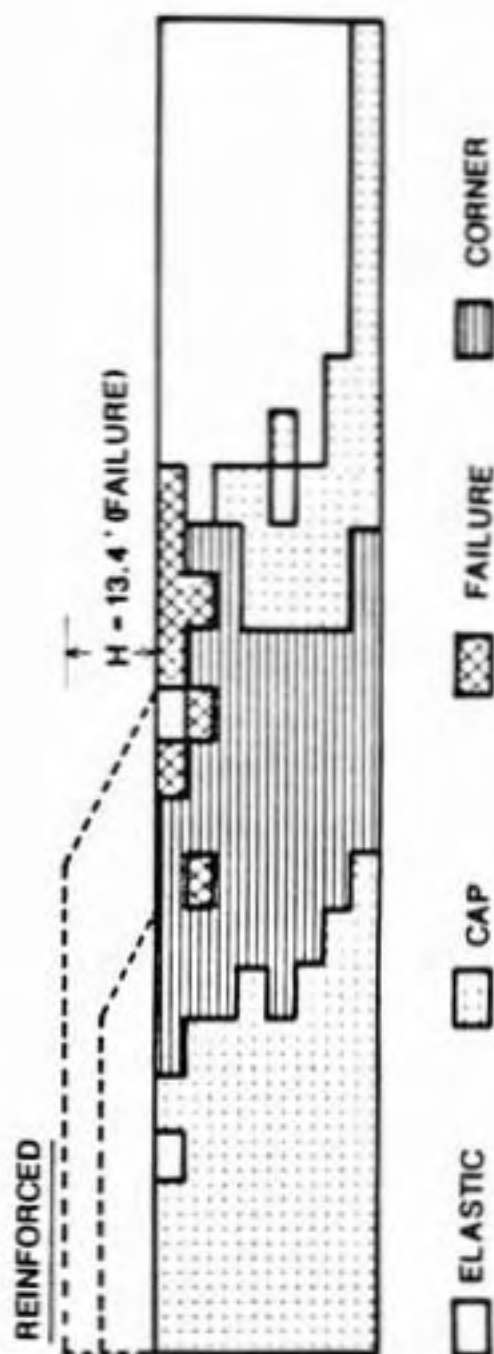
State in foundation for reinforced embankment at height of 13.4 ft (failure). 7.5-ft high existing embankment, 30-ft widened section, weak crust.
